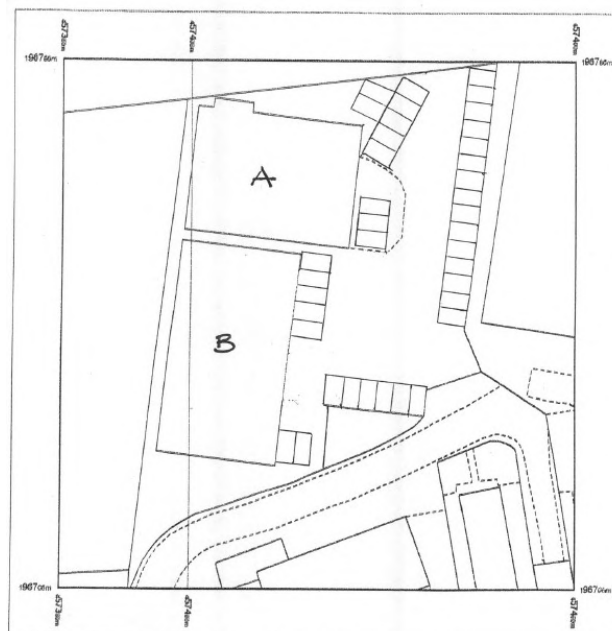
Block Plan of Building A and B – Abingdon Gymnastics Club
